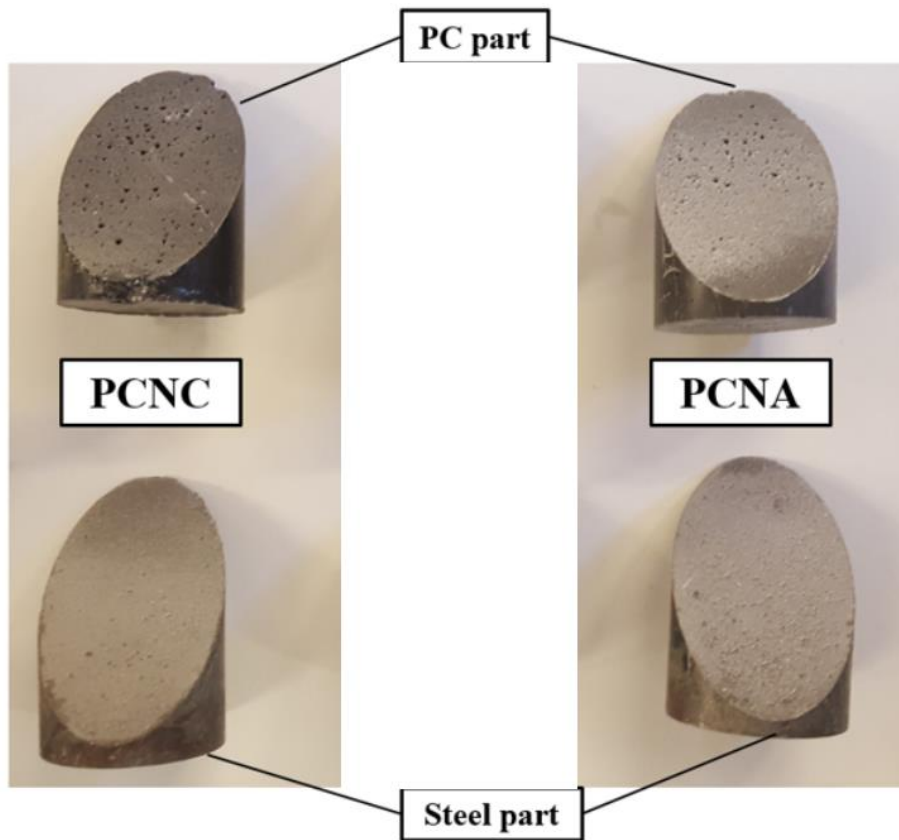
Slant shear fracture surface post-failure for all PC mixes showing complete adhesion failure.
